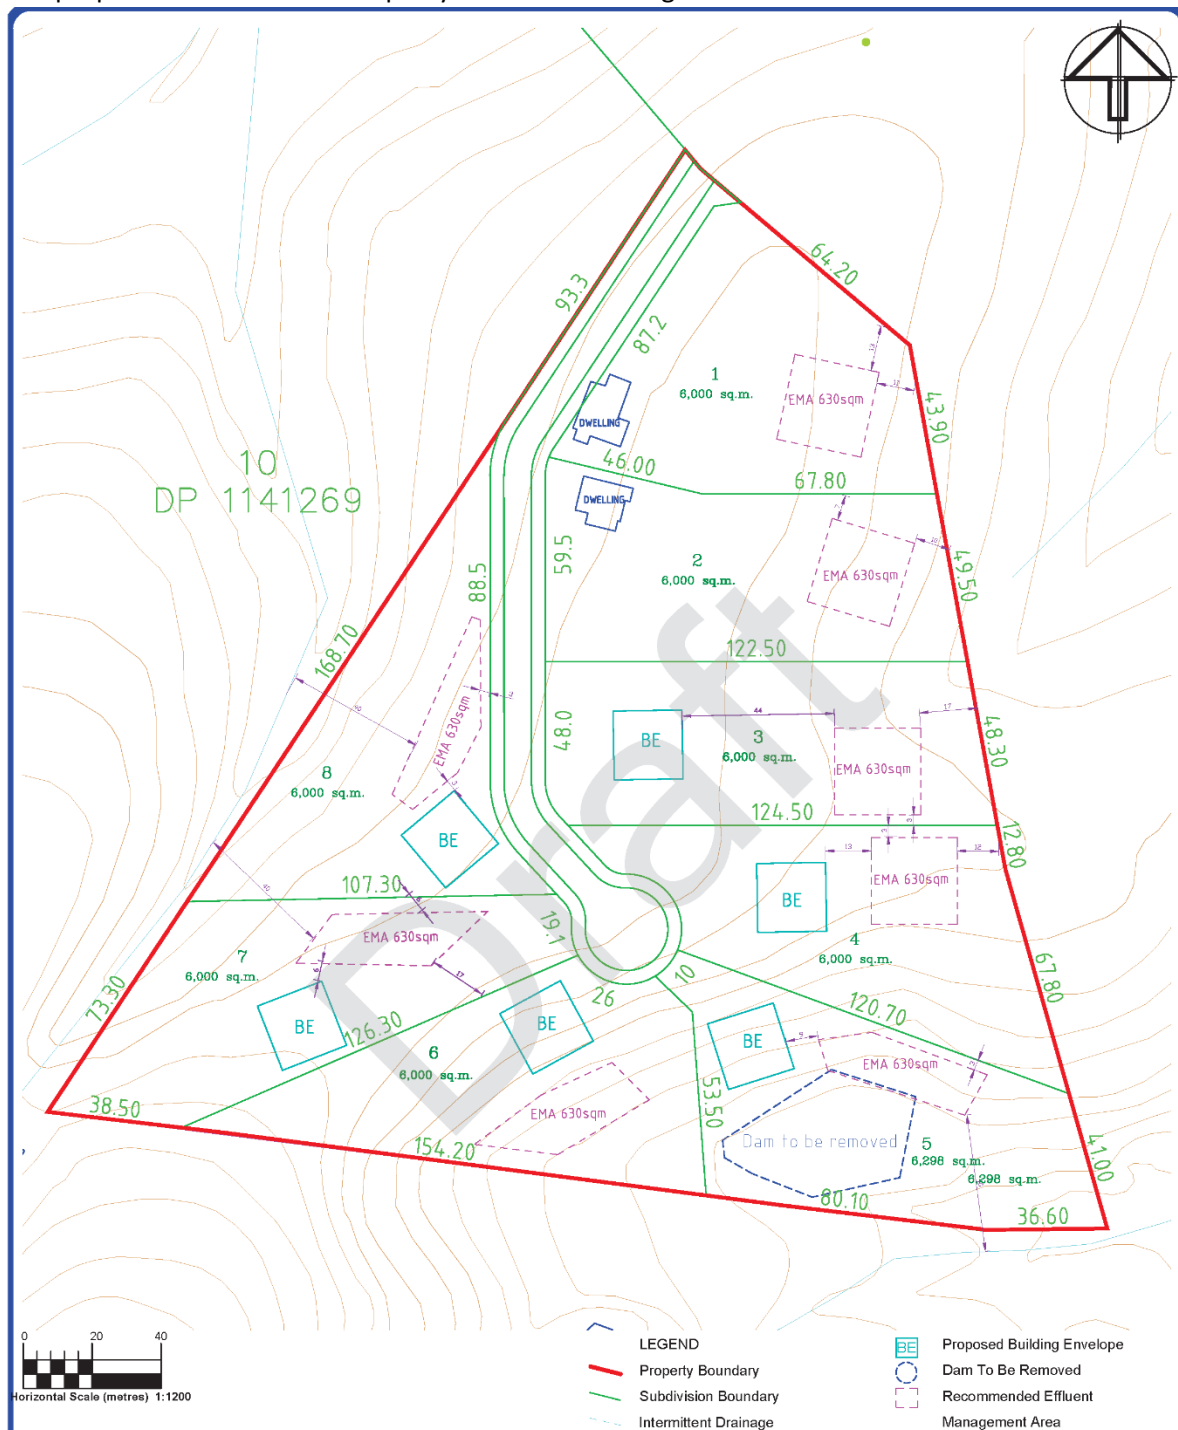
Proposed subdivision concept layout. Source: Earth Water Consulting (2020)
